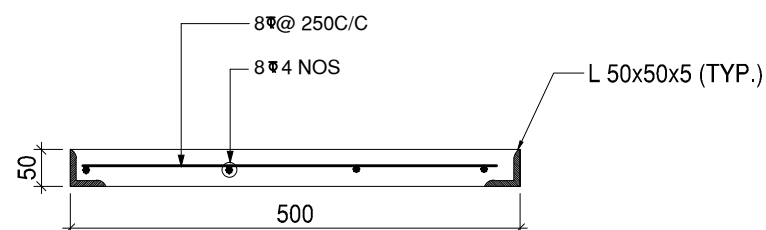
(DETAIL OF TRENCH COVER FOR SECTION A-A)
